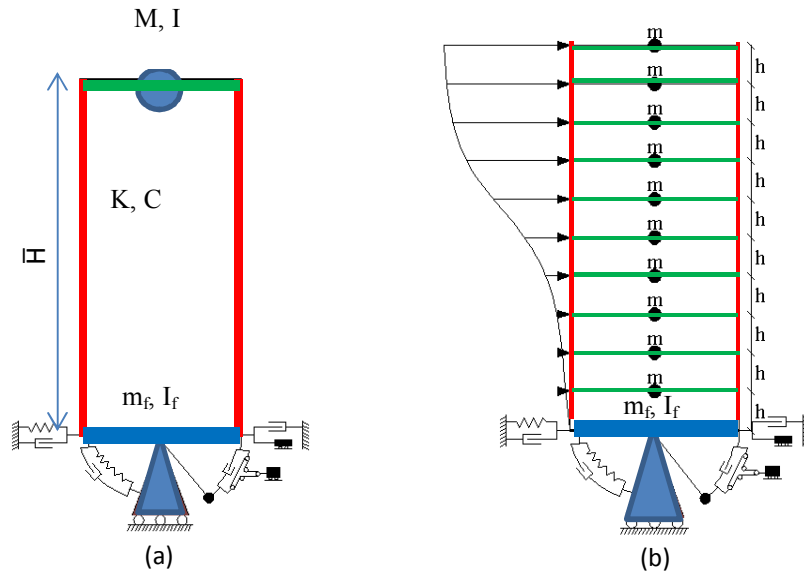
Soil-shallow foundation-structure models for sway and rocking motions (a) E-SDOF system (b) Typical MDOF system
